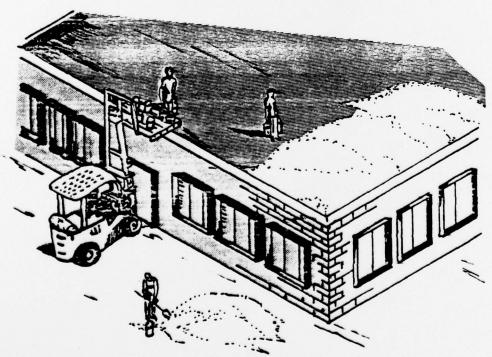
PLACING SOIL ON FLAT ROOF.
